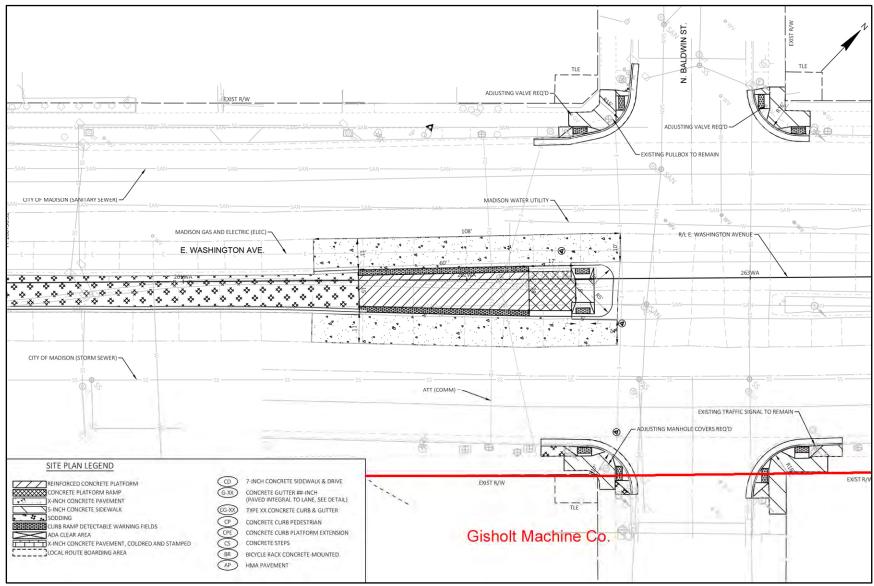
E. Washington Avenue at Baldwin Street – Plan View of Proposed Median Station In Vicinity of Gisholt Machine Company
